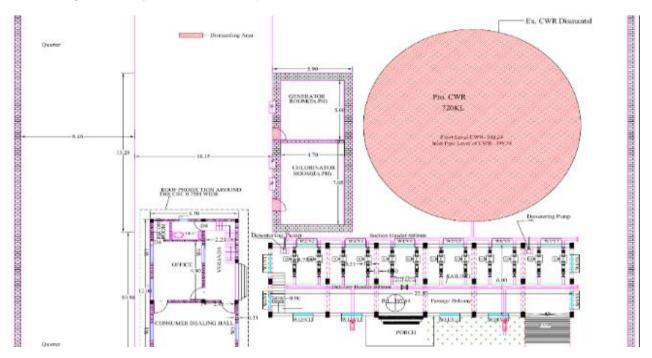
Layout Plan of Proposed CWR at Makrana Road Head Works
